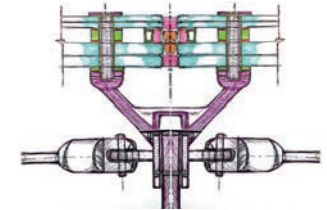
Typical spider clamp horizontal section sketch (drawn by Spencer Culhane)
